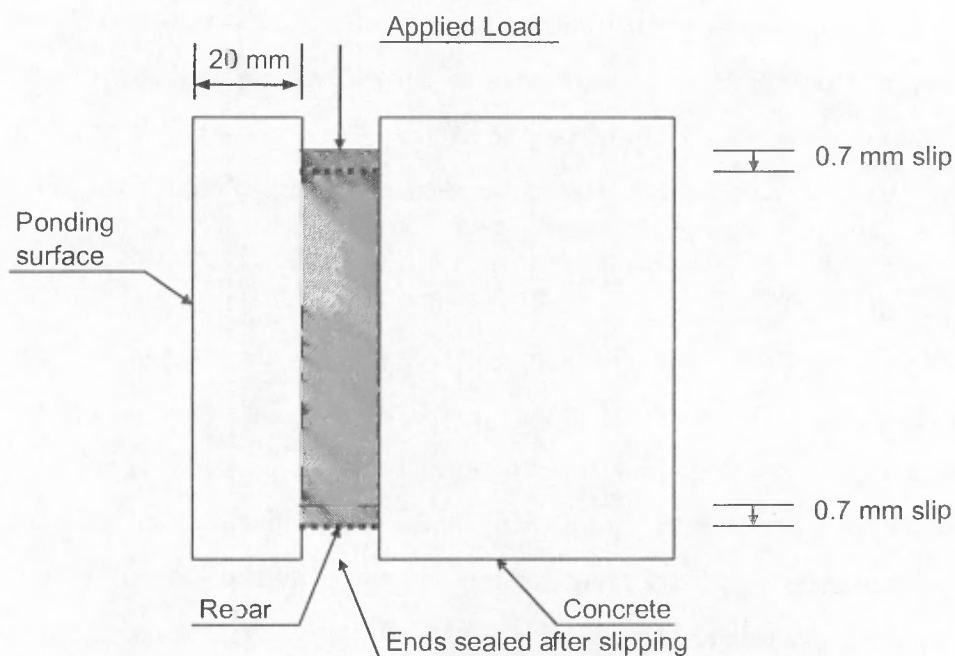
Cross section of sample with longitudinal slipping of round bar (not to scale)
